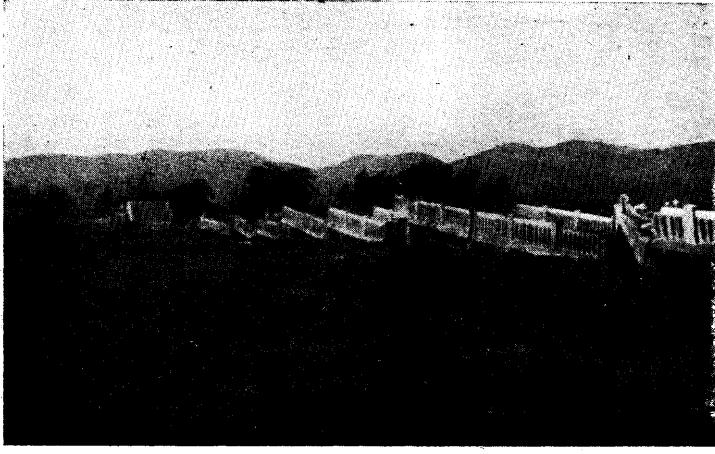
Destruction of a Concrete Bridge near Kozu.
